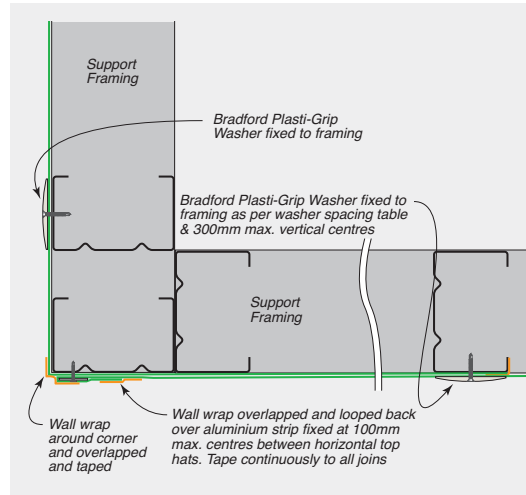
Internal Corner – Wall Wrap Continuous
